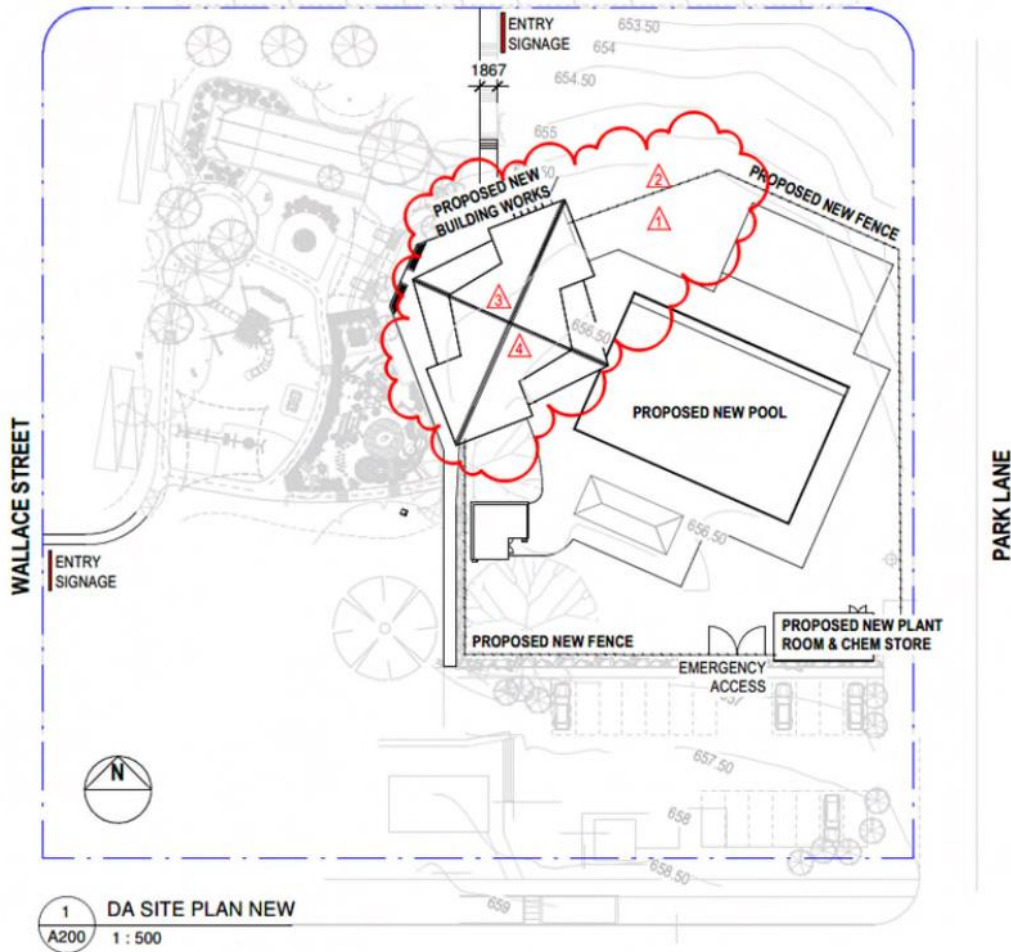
Site Plan (Prepared by Paul Barnett Design Group)
